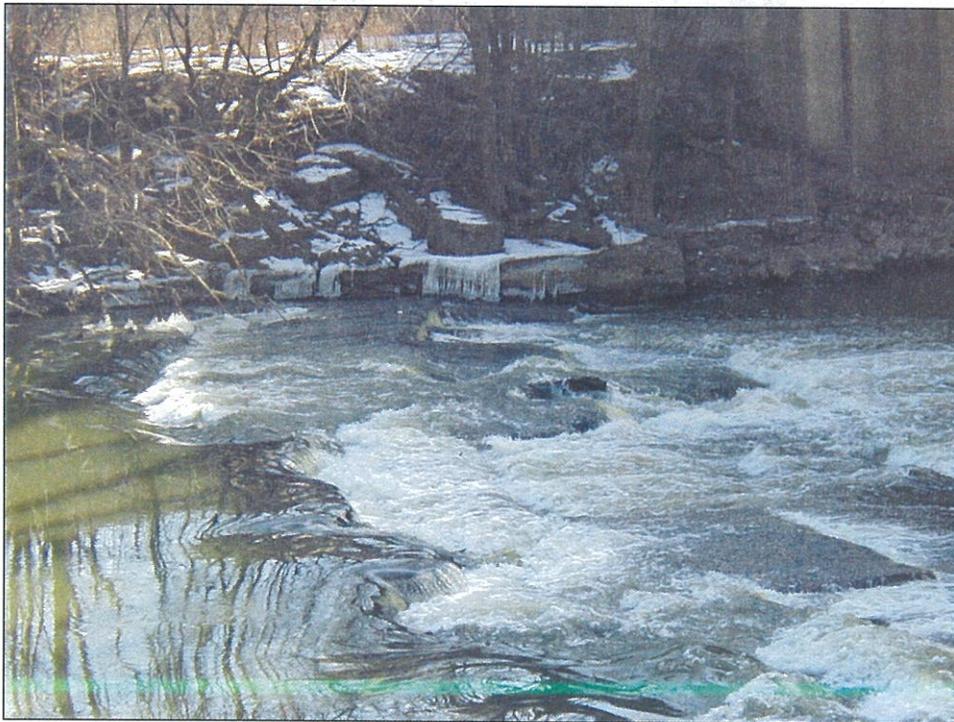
Republic Steel Campbell Works Dam, Youngstown. View looking south.
